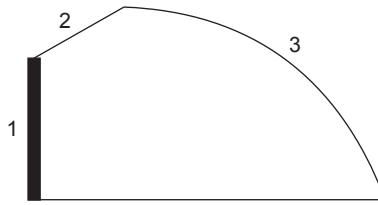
Schematic presentation of the Chinese greenhouse concept. 1: North wall made of brick or other similar material, 2: non-transparent north roof made of light materials, 3: south roof made of transparent greenhouse cover.
